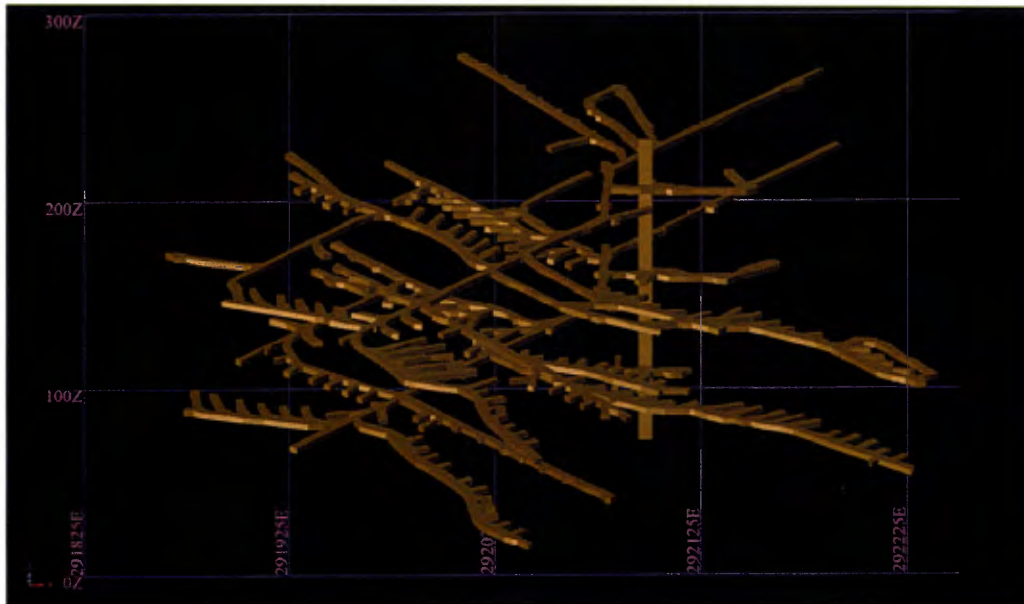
1 Underground levels reconstructed from historic underground plans.
